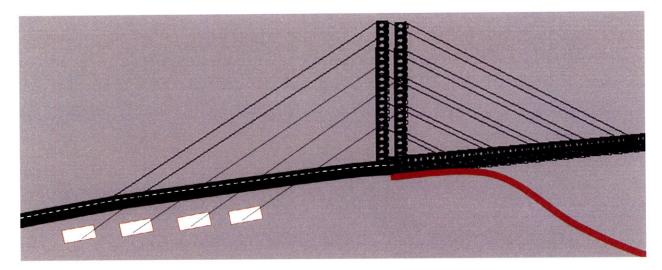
ANCHORING SCHEME WITH MULTIPLE CABLES
